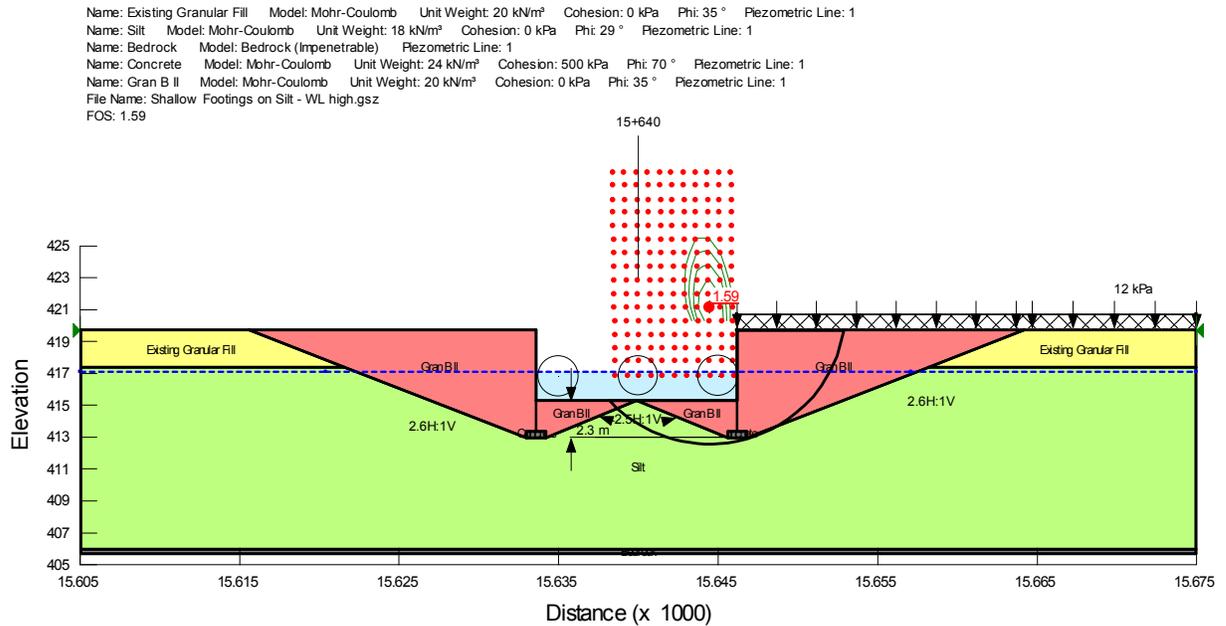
Shallow Foundation Excavation, Profile Section
